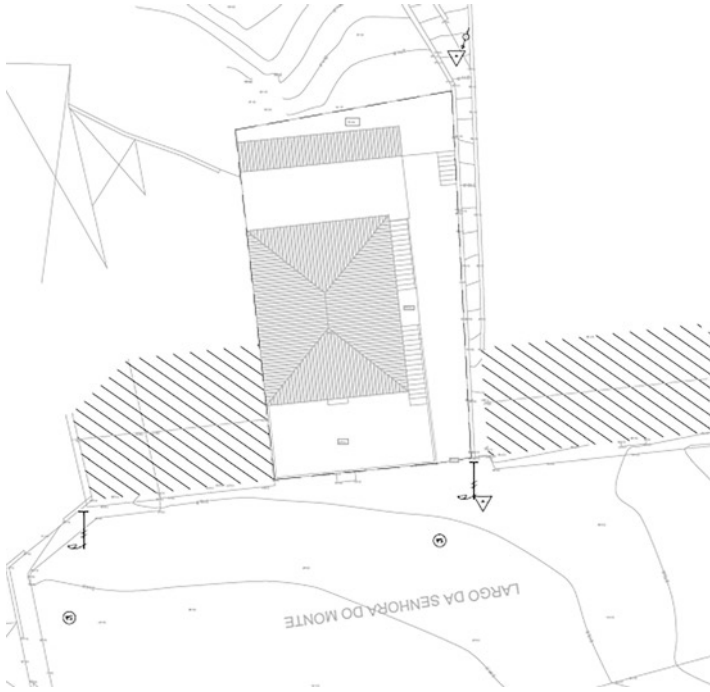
Building detail. (Source: GAIURB, 2022)
